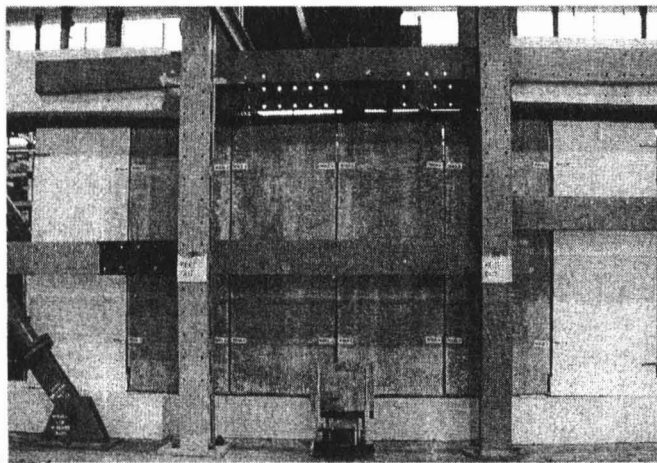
shows the reinforcement details and the experimental setup of the super-assemblage. Wall 1 and Wall 2 together with their own foundation and four new hollowcore units as the non-seismic infill wall panels. Initially, 20mm diameter, 500mm long fuse-bars were used in series with the 25mm thread bar tendons. They were inserted into the second and fifth void sections of the seismic walls and screwed into couplers located at two-thirds height of the walls, as shown in Figure 3(a). An infill spread footing foundation beam (4730x350x400mm) was constructed between the original seismic foundation beams (that were located beneath the seismic panels) and connected contiguously to the seismic foundation beam. The entire foundation beam was anchored to the laboratory strong floor to inhibit sliding, but note that no uplift or hold down restraint was provided. This was to ensure the foundation beam was a true representation of a spread footing. Beneath the non-seismic wall panels a 4730x350x20mm rubber pad (IRHD55) was placed to seat those panels.
